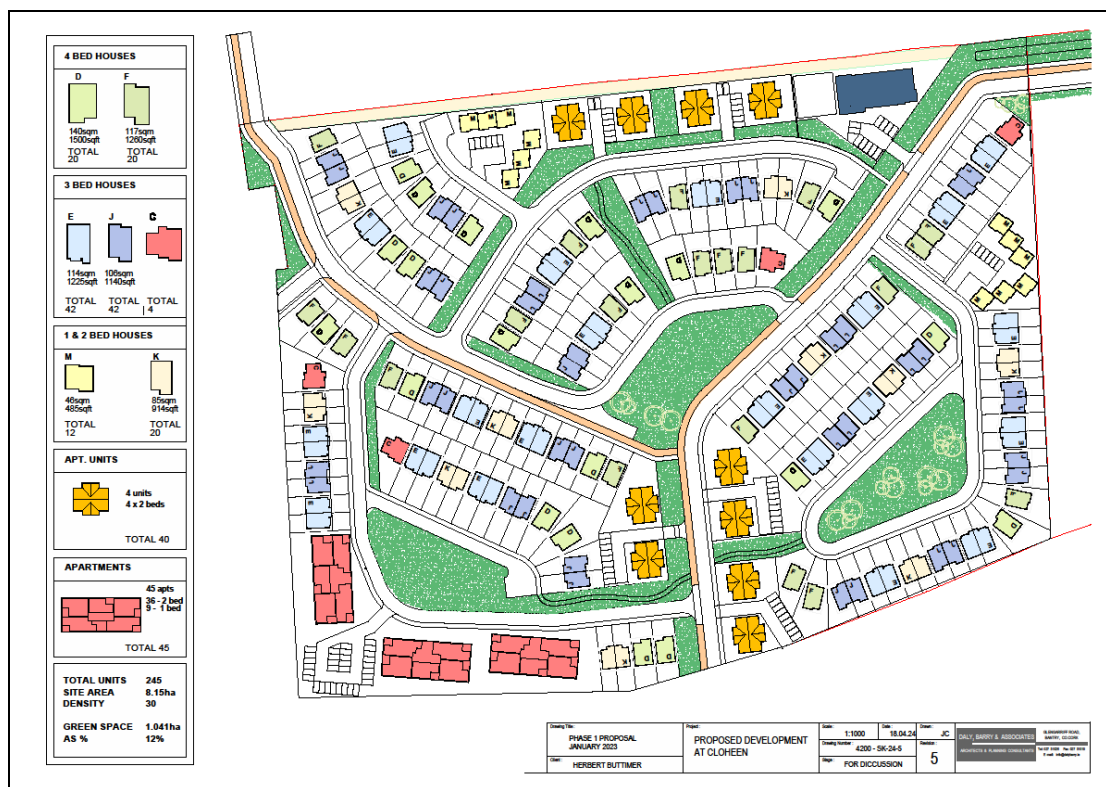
Proposed Site Layout – April 2024 (30units/Ha)
